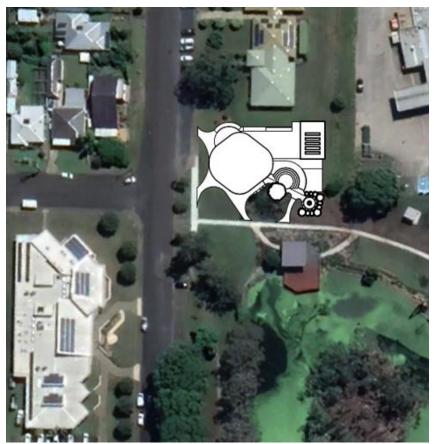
Site plan showing approved Gumbaynggirr Keeping Place
